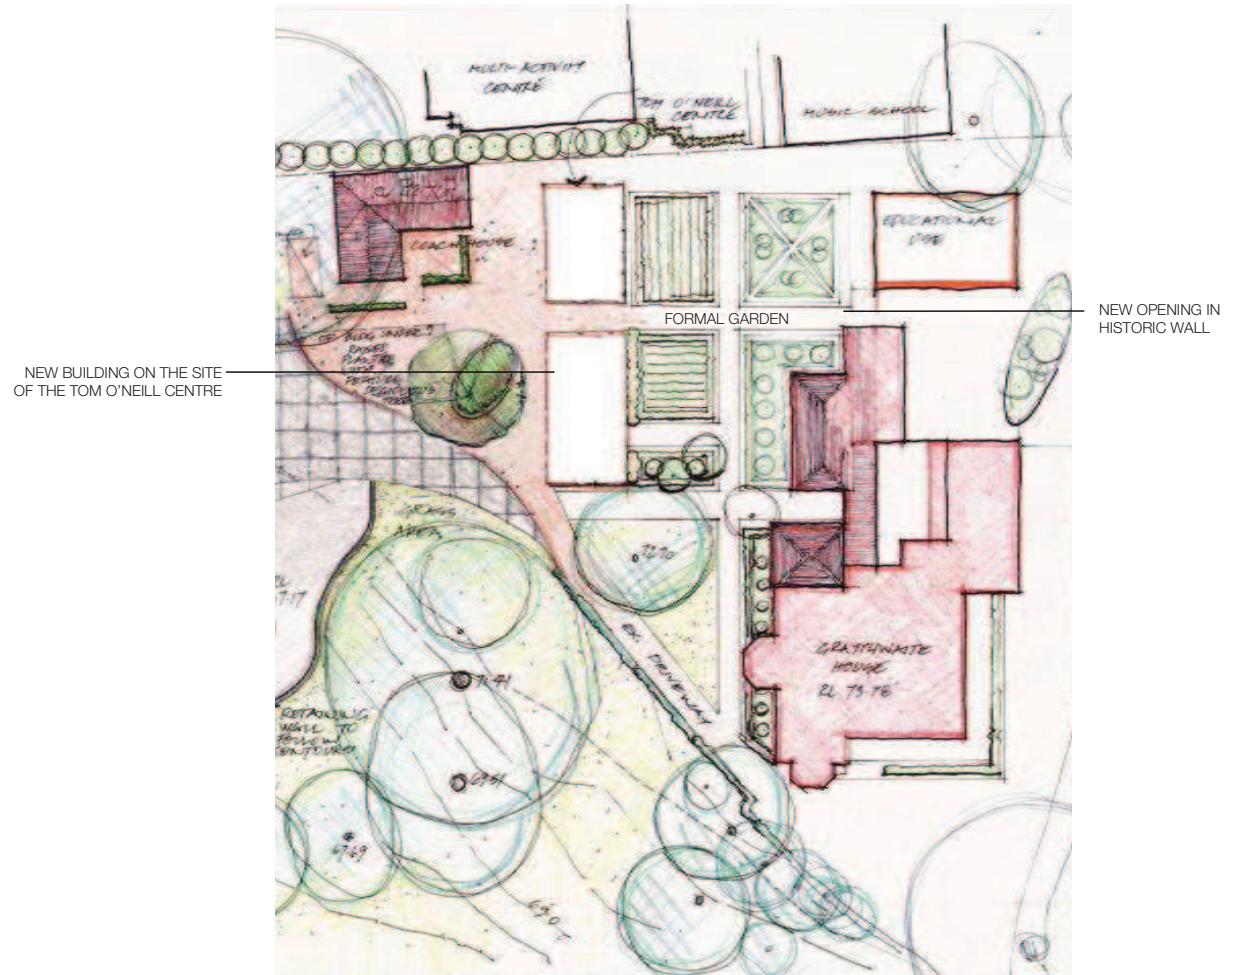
Plan of proposed renewed Formal Garden (Taylor Brammer Landscape Architects)
